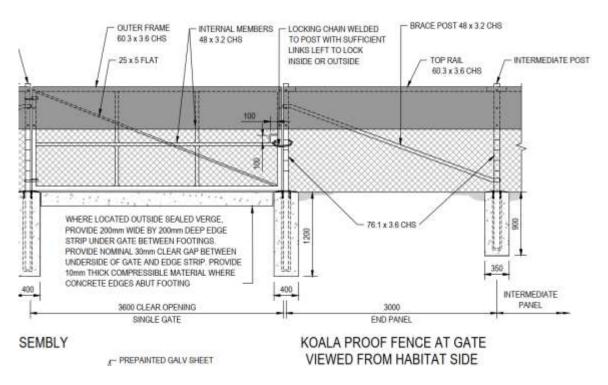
Indicative elevation - Koala fencing and gate (3.6m-wide gate detail)
